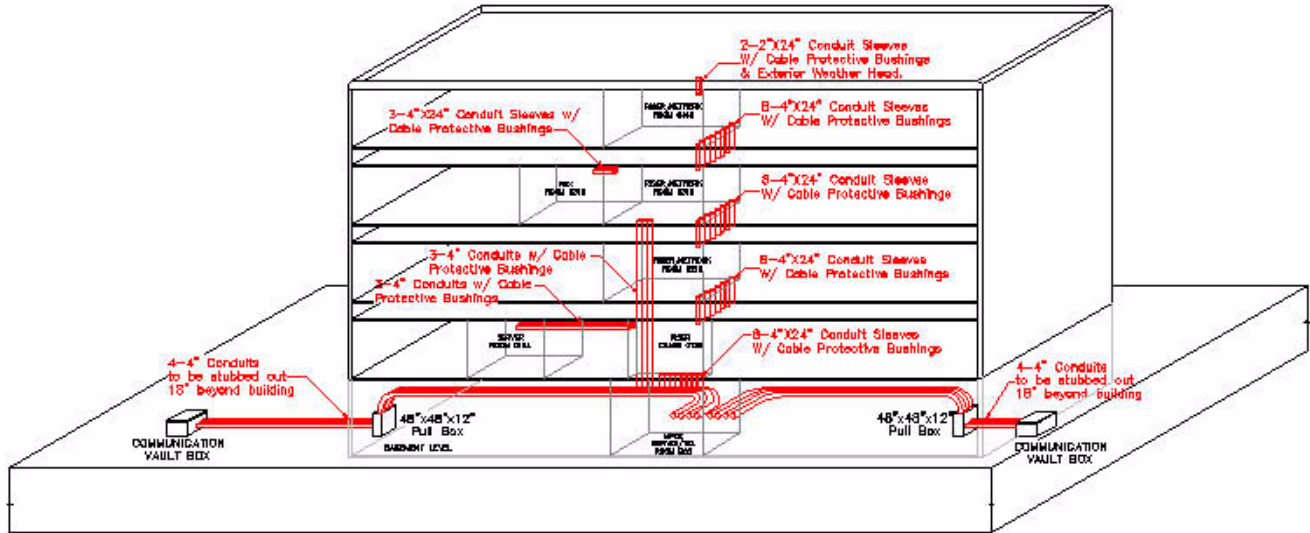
External conduit has become an important part of the planning of modern campus networks. Plan for large conduits to accommodate cabling from multiple service providers. Vault boxes should be built large enough to be shared by multiple providers. Conduit enters buildings at MPOE and then services go to MDFs and, through risers, to IDFs on different building floors. Multitenant buildings share MPOEs and have separate MDFs and IDFs.
